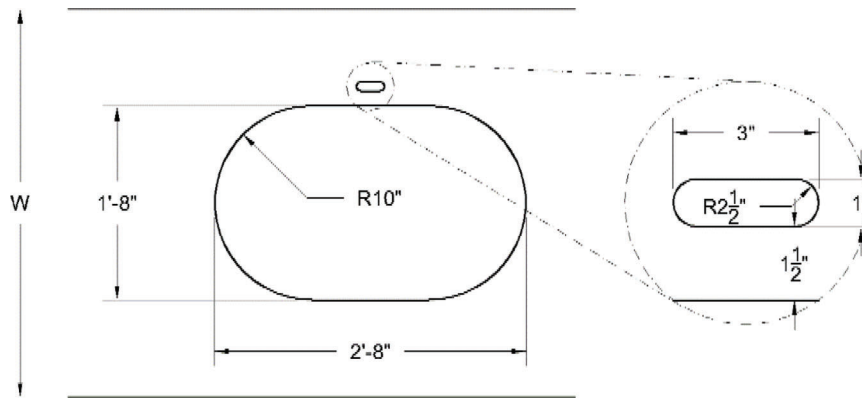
Annotated sketches of tub girder inspection access hole geometries modeled.
